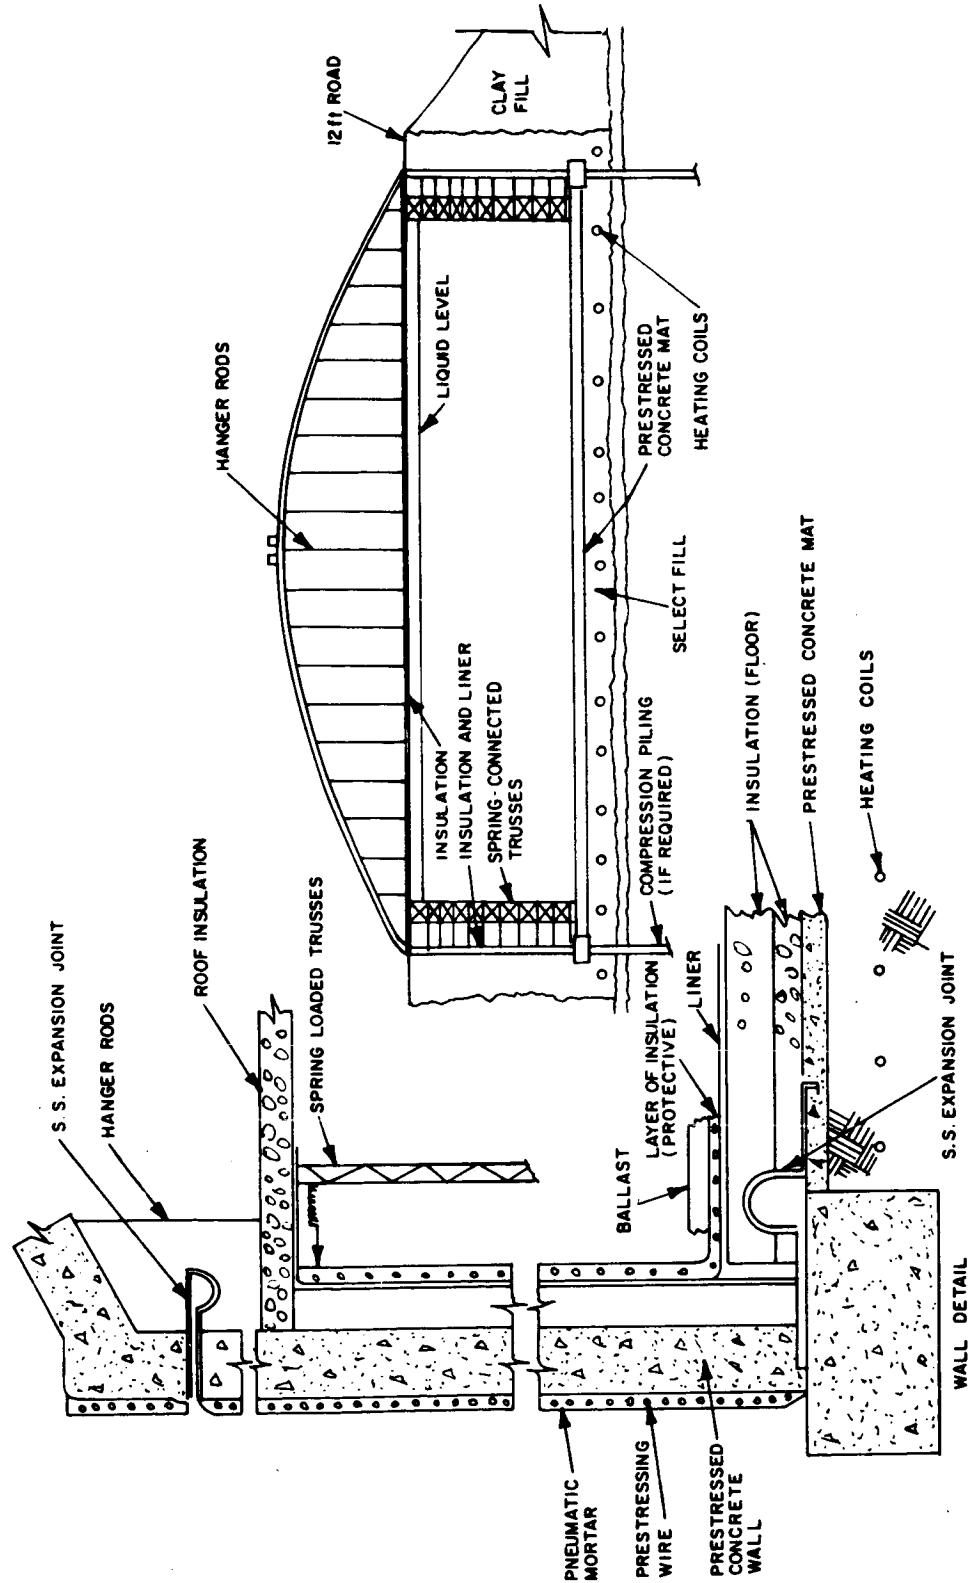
INTERNALLY INSULATED PRESTRESSED CONCRETE TANKS
